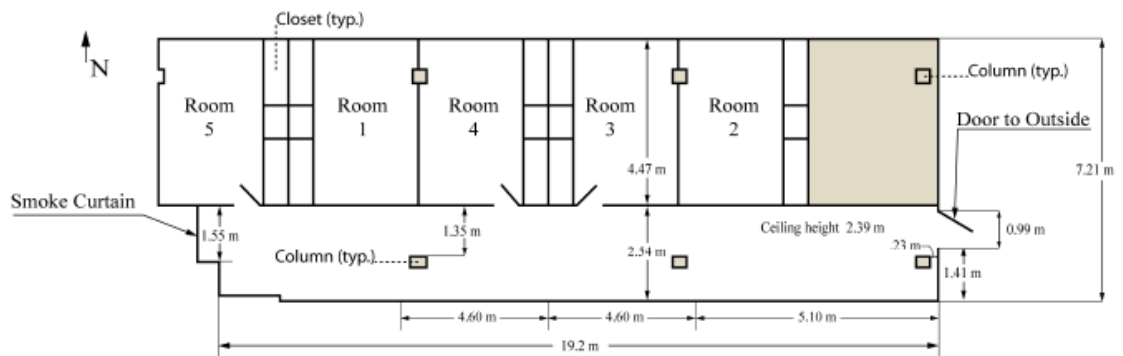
Schematic of the layout of the sleeping room dormitory fire tests (Madrzykowski and Walton, 2010)
